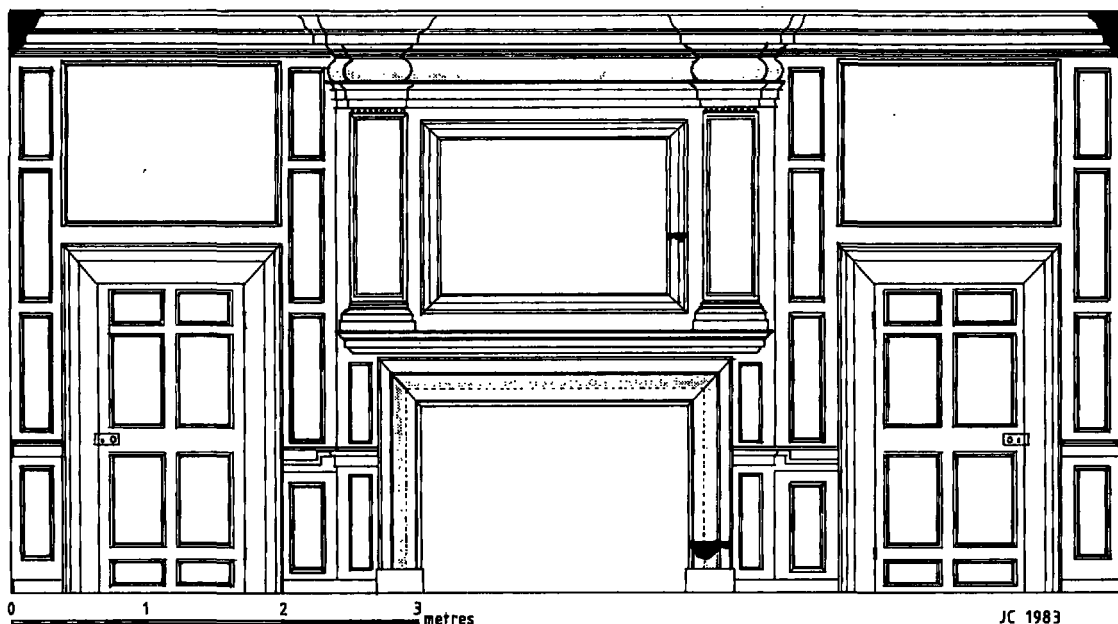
Panelling and chimney-piece dated 1666–70 by London joiners Whetstone, Lewis and Oke, at south end of 'Great Dining-Room' in the Prior's Hall.
